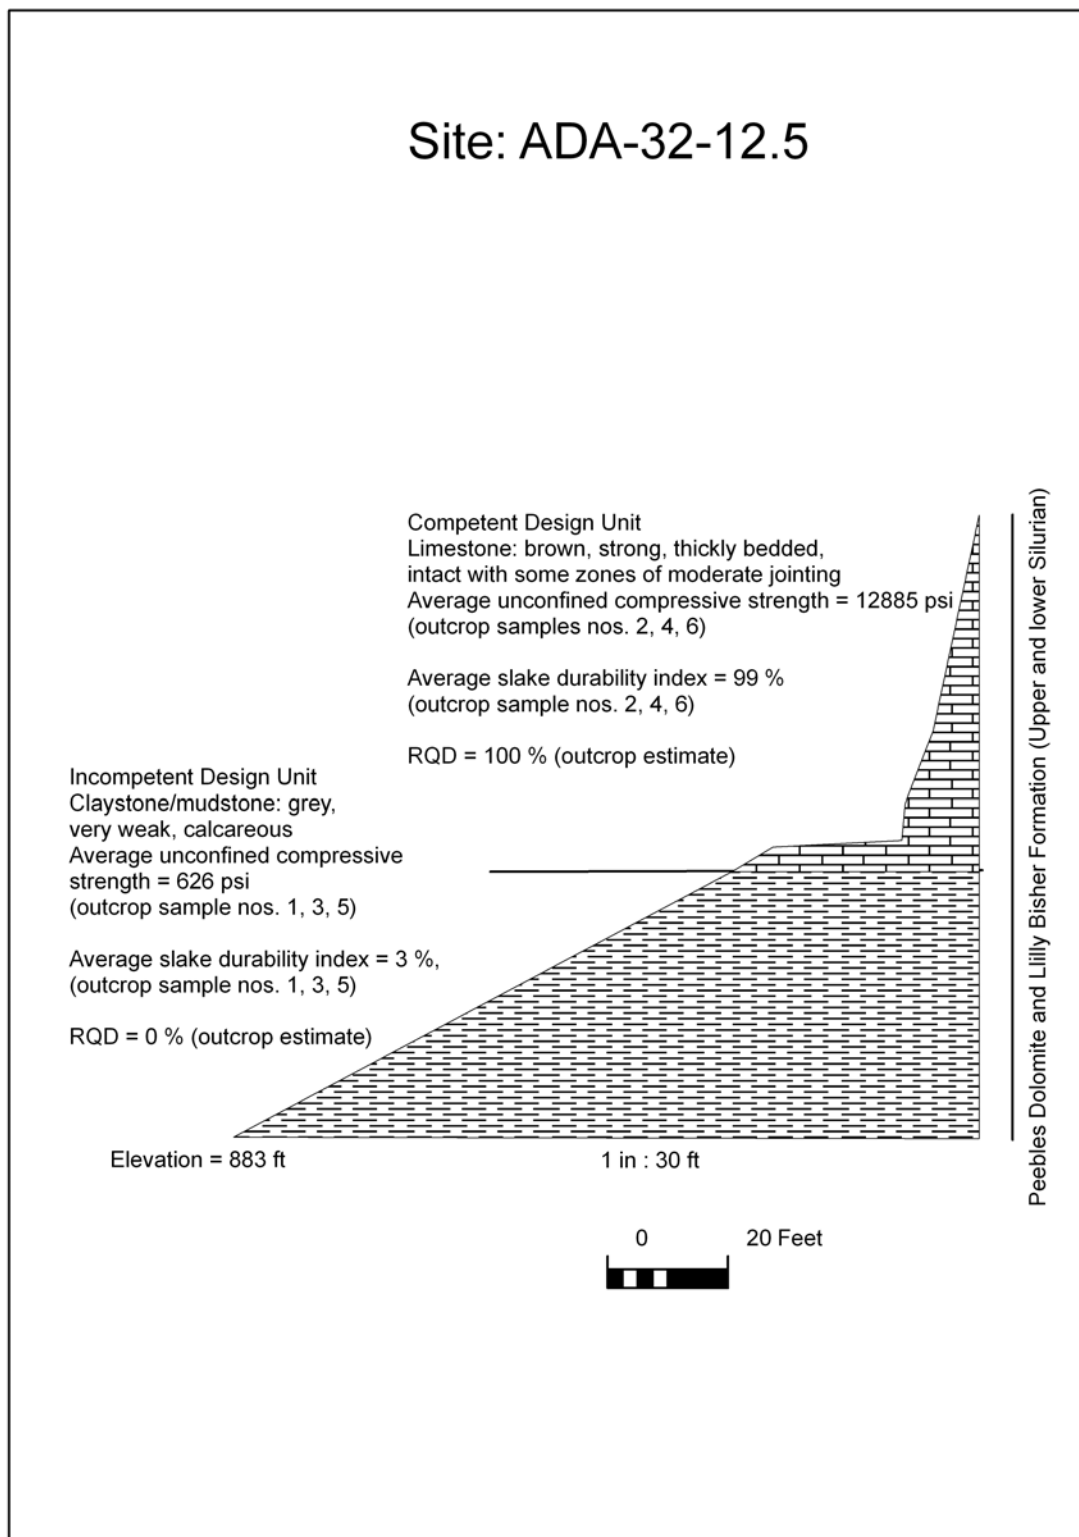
Stratigraphic cross-section for ADA-32-12.5.
